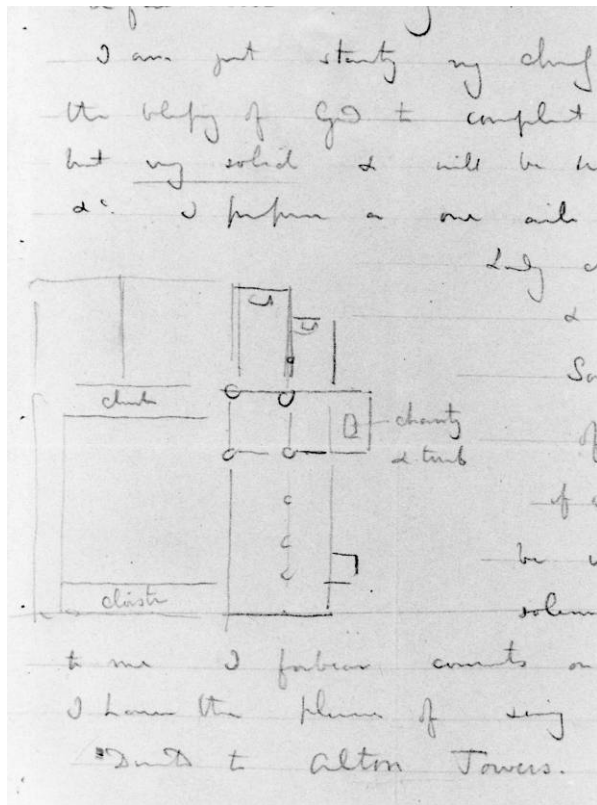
Pugin's 1845 sketch<sup>216</sup> of the floor plan he envisioned for the St. Augustine's compound, showing cloisters, chantry, central piers and columns. He also clearly delineates the nave, chancel, aisle, Lady chapel and southwest porch. (Photo used with permission from the Bloxam Archives, Fairfield Library, Magdalen College, Oxford, UK. See Appendix E, page 215.)
